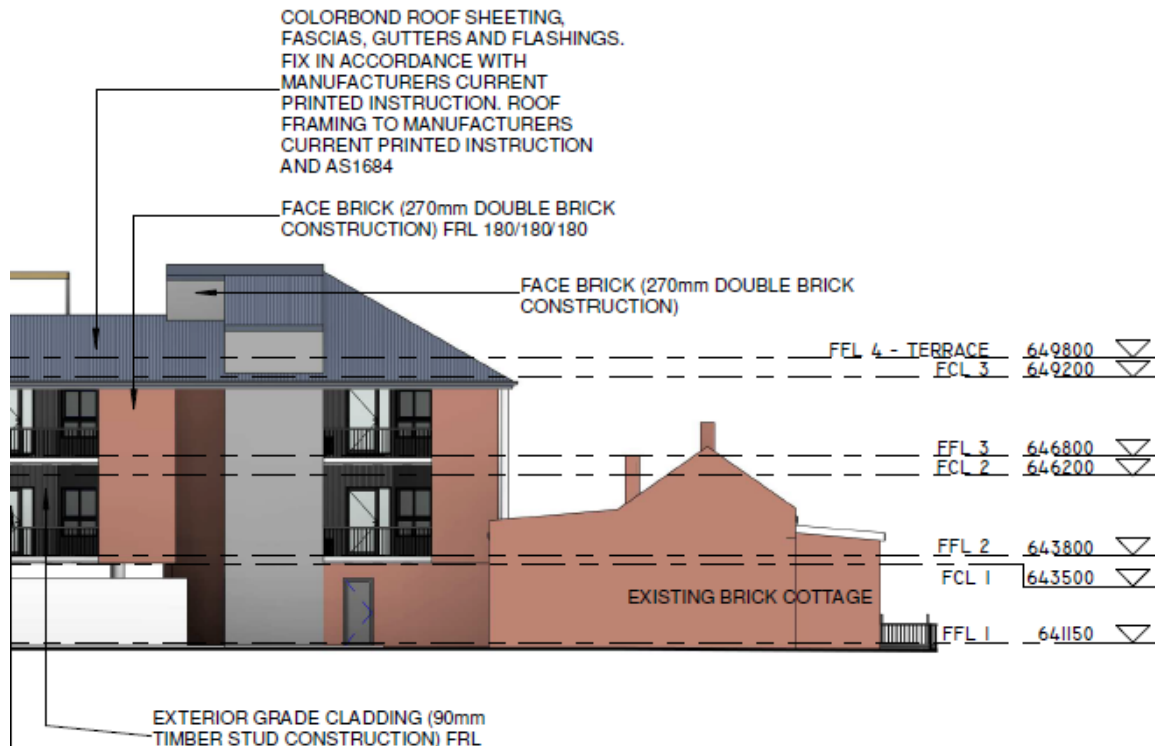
61-63 Bradley St Contextual setting West elevation to indicate massing of proposed development against the existing dwellings (Source: TLA)
